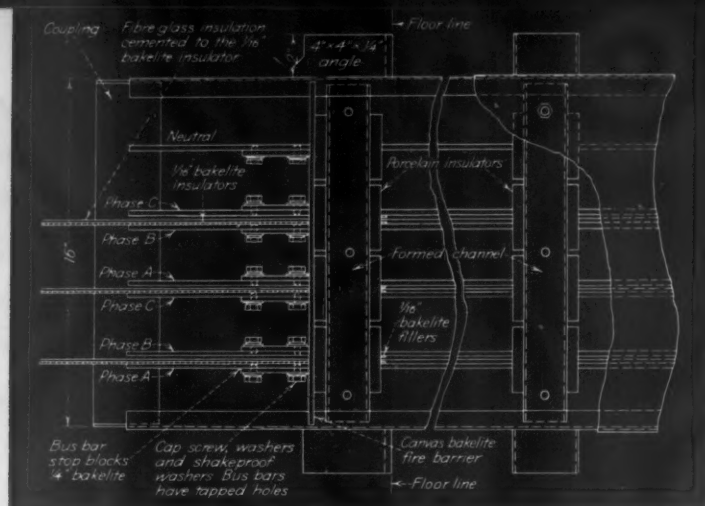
Detail of 2,000-ampere, 4-pole bus duct construction at floor level showing bus bar insulators and supporting blocks; also fire barrier. Note paired, opposite-phase polarity arrangement of buses.
